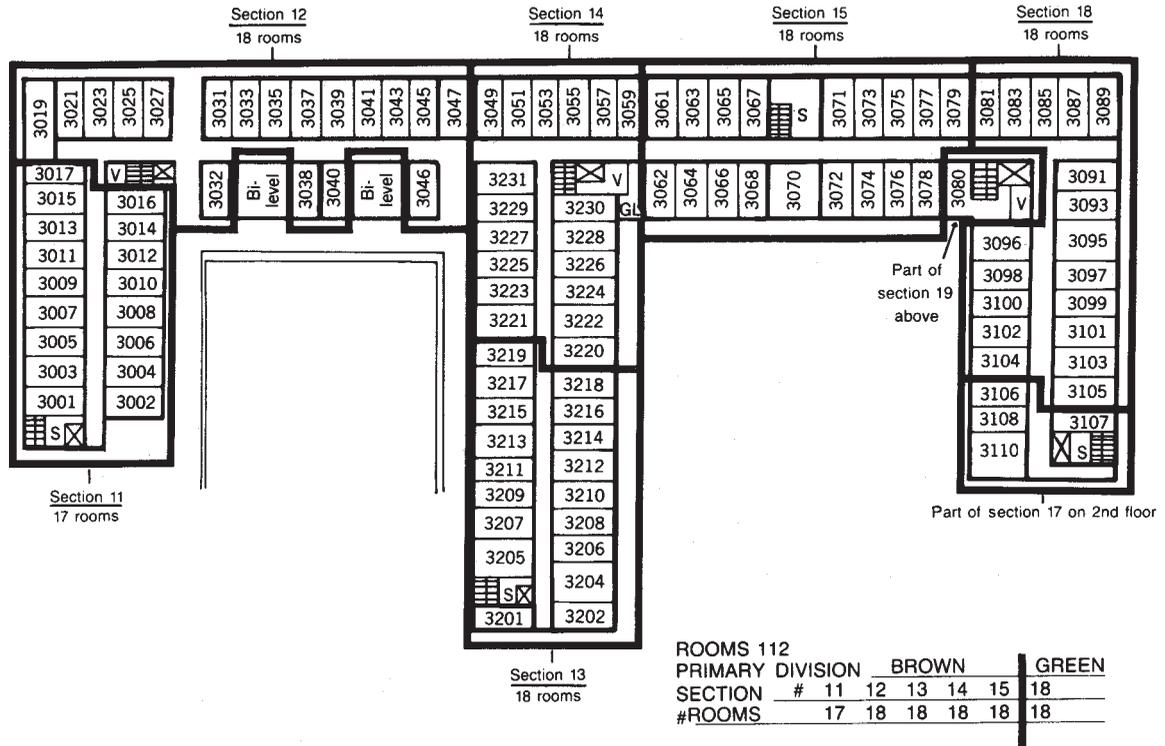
House Breakout Plan of the model hotel; third floor.
